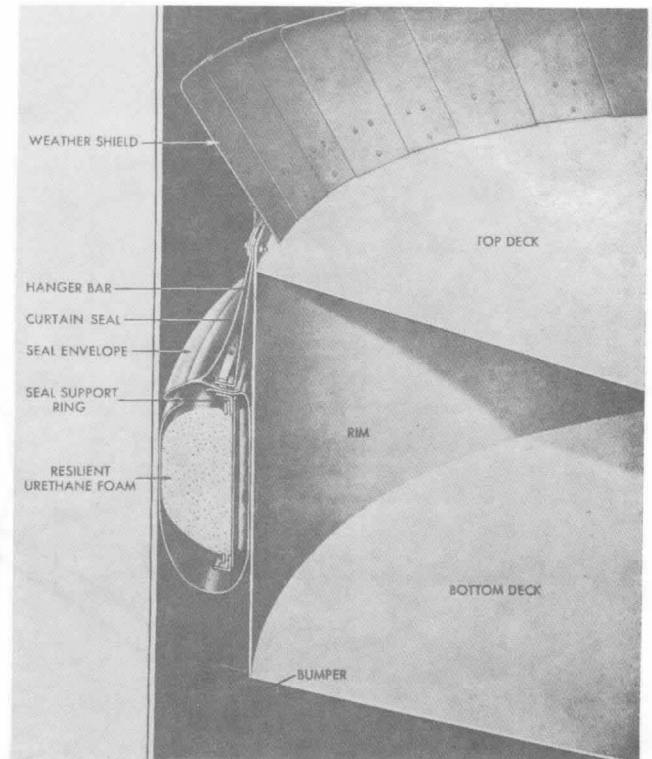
(b) Tube Seal Open-Top Floating Roof Tank.
